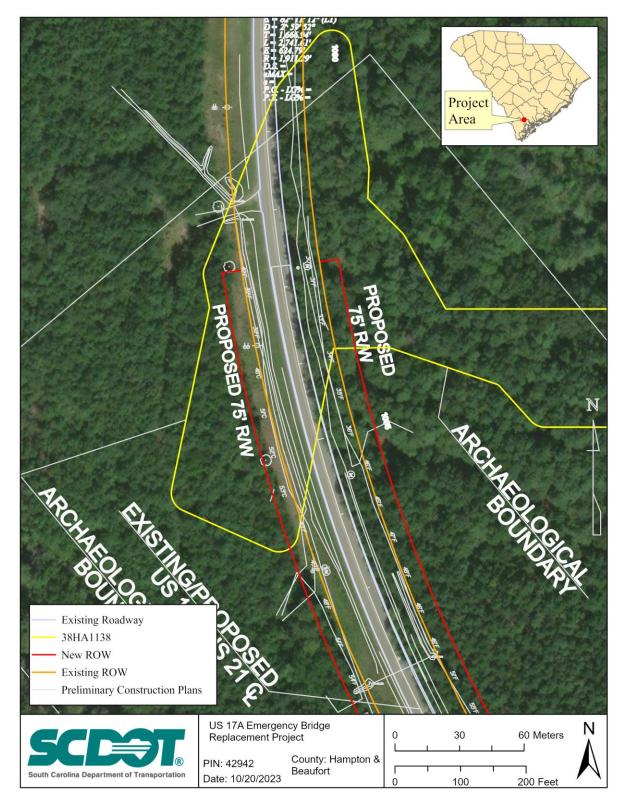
Preliminary construction plans, highlighting the 38HA1138 site boundary with existing and proposed new ROW
